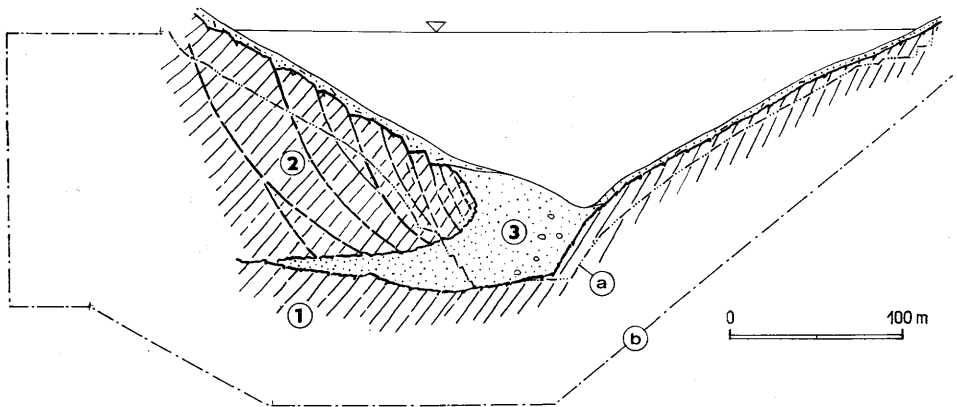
Section of the Beauregard damsite (after A. Desio). 1, firm mica-schists; 2, disturbed downslipped mica-schists; 3, glaciofluvial sandy gravel; a) excavation for arch-dam foundations; b) outline of grout curtain.
